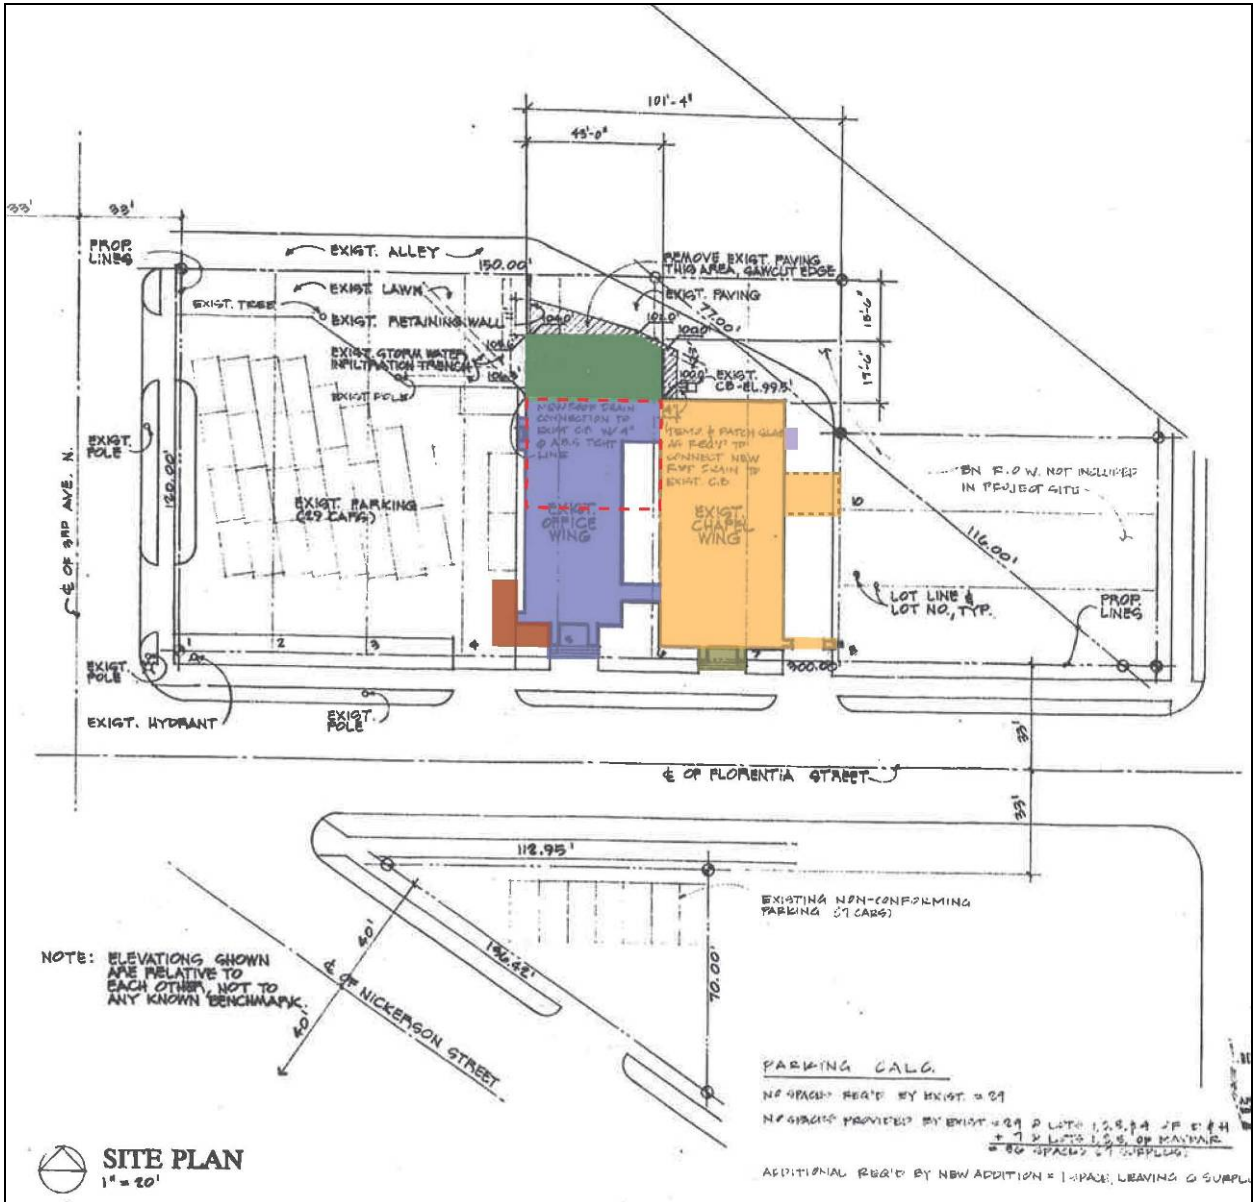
Above, the site plan. This site plan, part of a permit drawing from 1991 by KSWA Architects, has been modified with the addition of colors to indicate the building's construction chronology:
